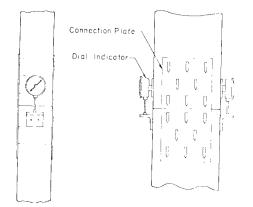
Typical Arrangement for Tension Tests of Plate-Type Joints
